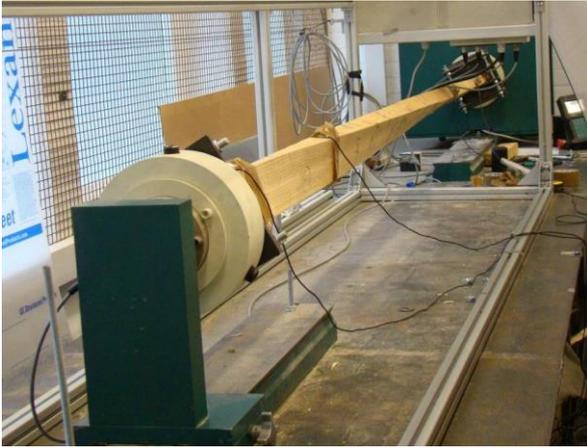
A typical 3.6 m joists with large rotational deformation before the fracture
